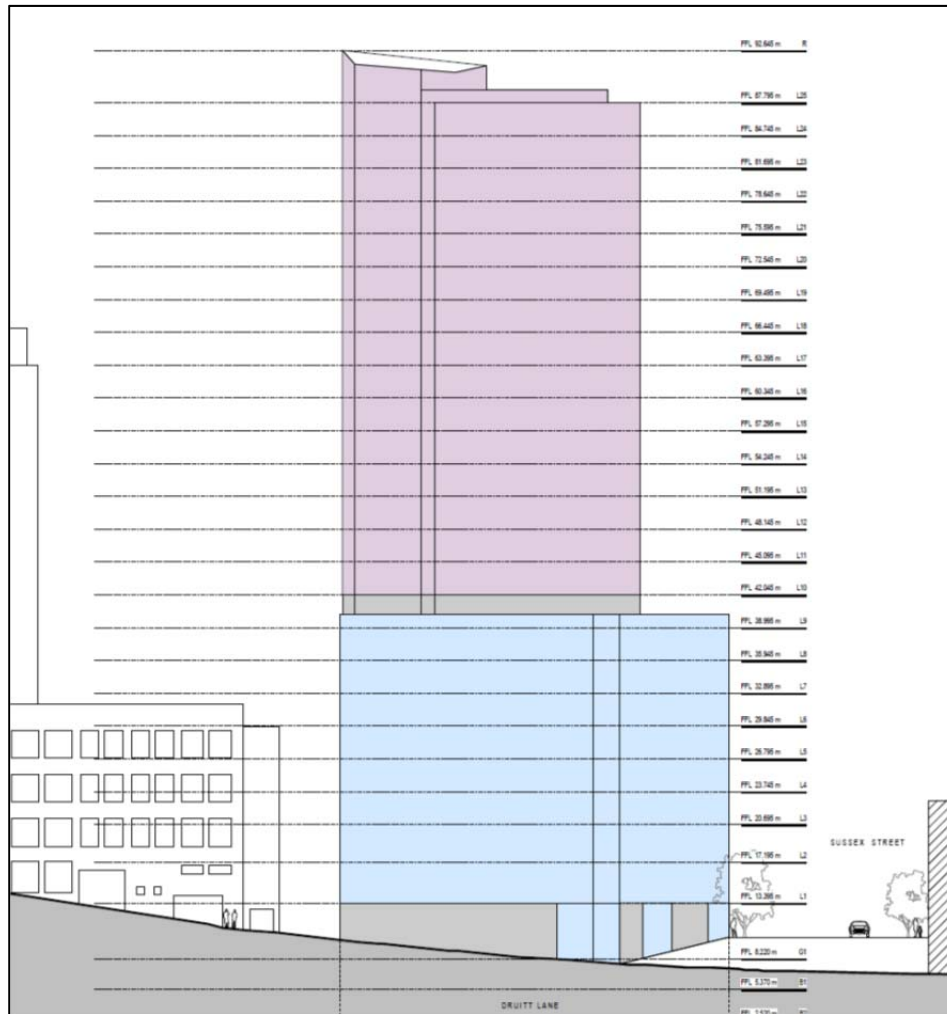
The northern elevation of the proposed building envelope, as viewed from DrUITT Lane
